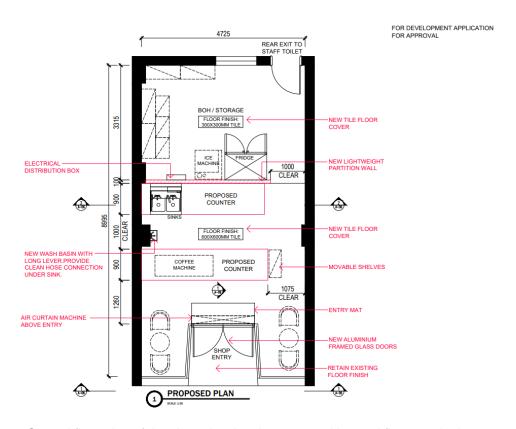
Ground floor plan of the shop showing the proposed internal fit out and minor external works, *Source:* Aether Architects.
